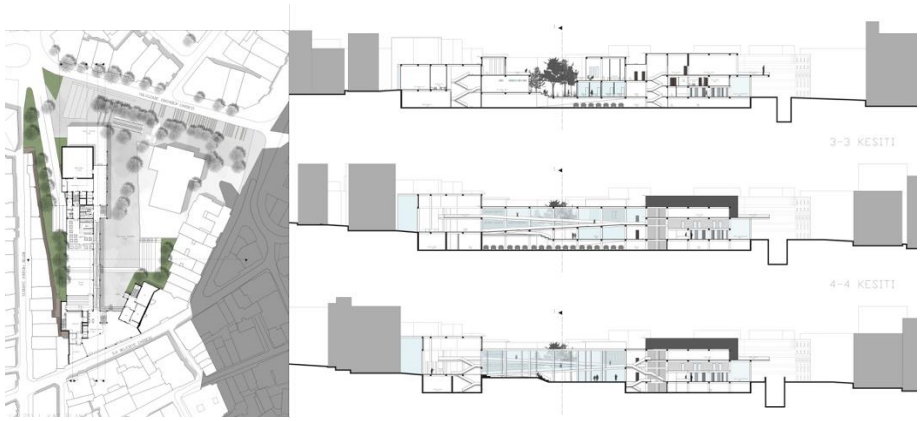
Site Plan-Sections, MP3 Dilara Uçar, Güldehan Atay Design Studio- 2014
